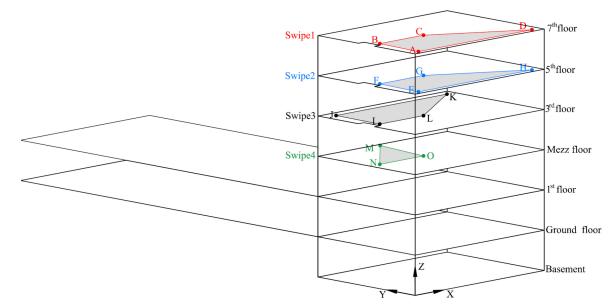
, schematic floor plans of the tower and test points used in modal test (a) 7<sup>th</sup> floor, (b) 5<sup>th</sup>
